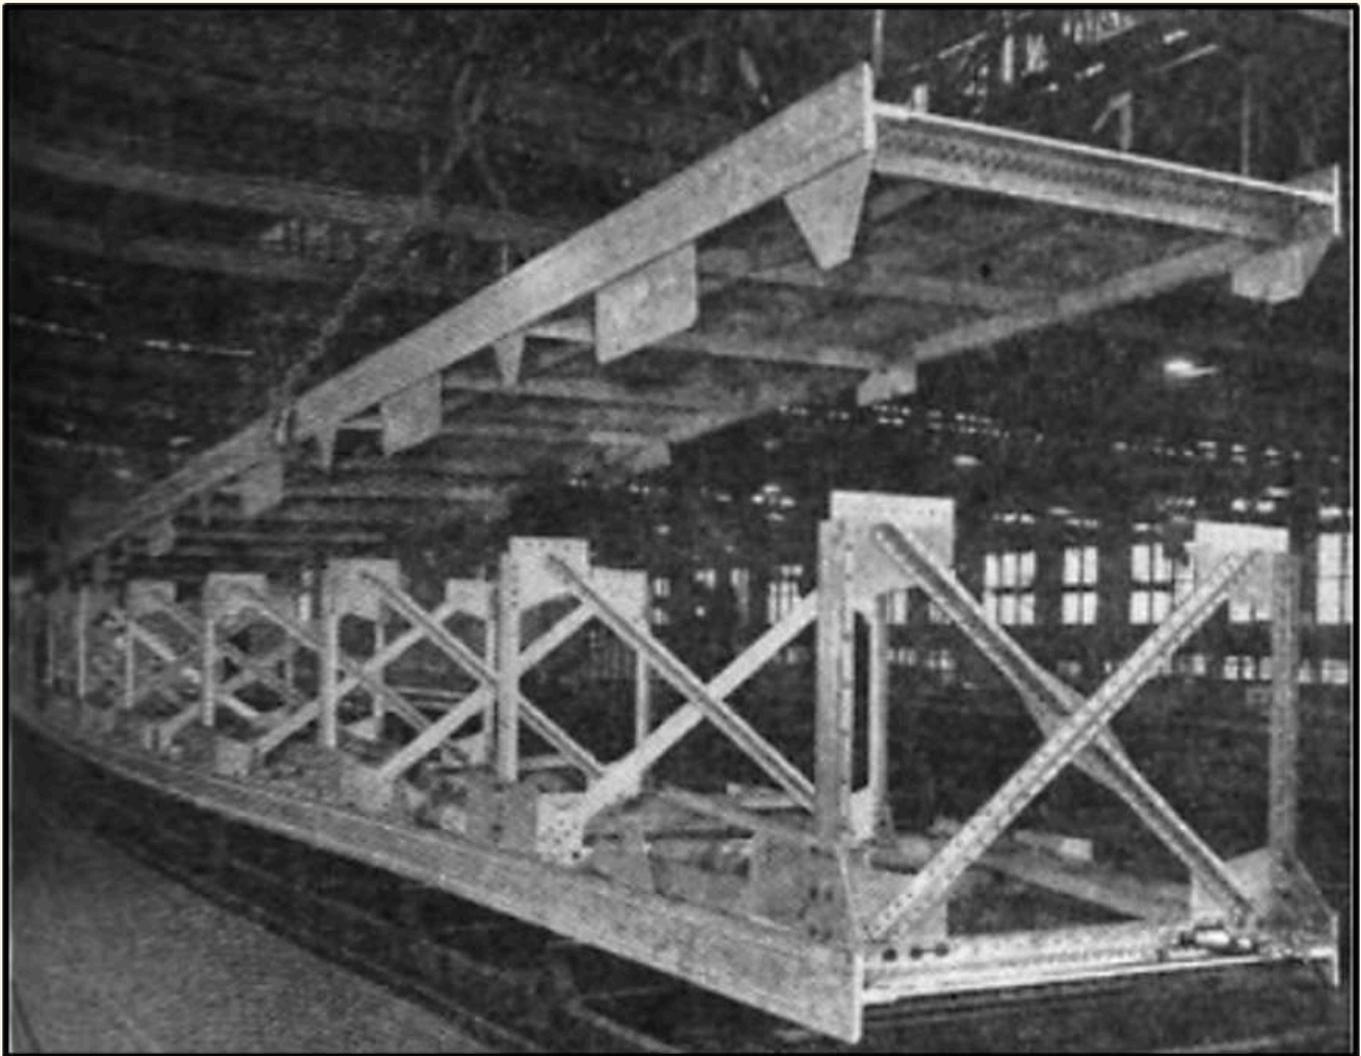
Lowering one of the girders into position to complete the shop assembly of the all-aluminium span. Photo from *Railway Age*, All-Aluminum Bridge Span Makes Debut⁴.
